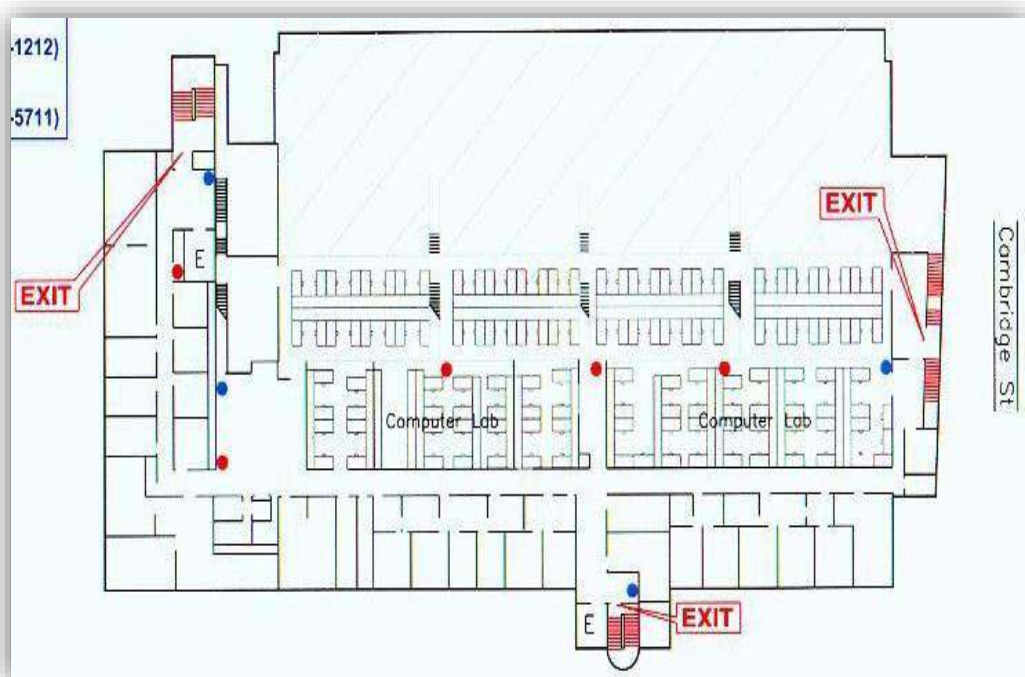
Third floor plan of the Harvard Graduate School of Design, Cambridge Massachusetts. Source: Great Buildings (2012).
